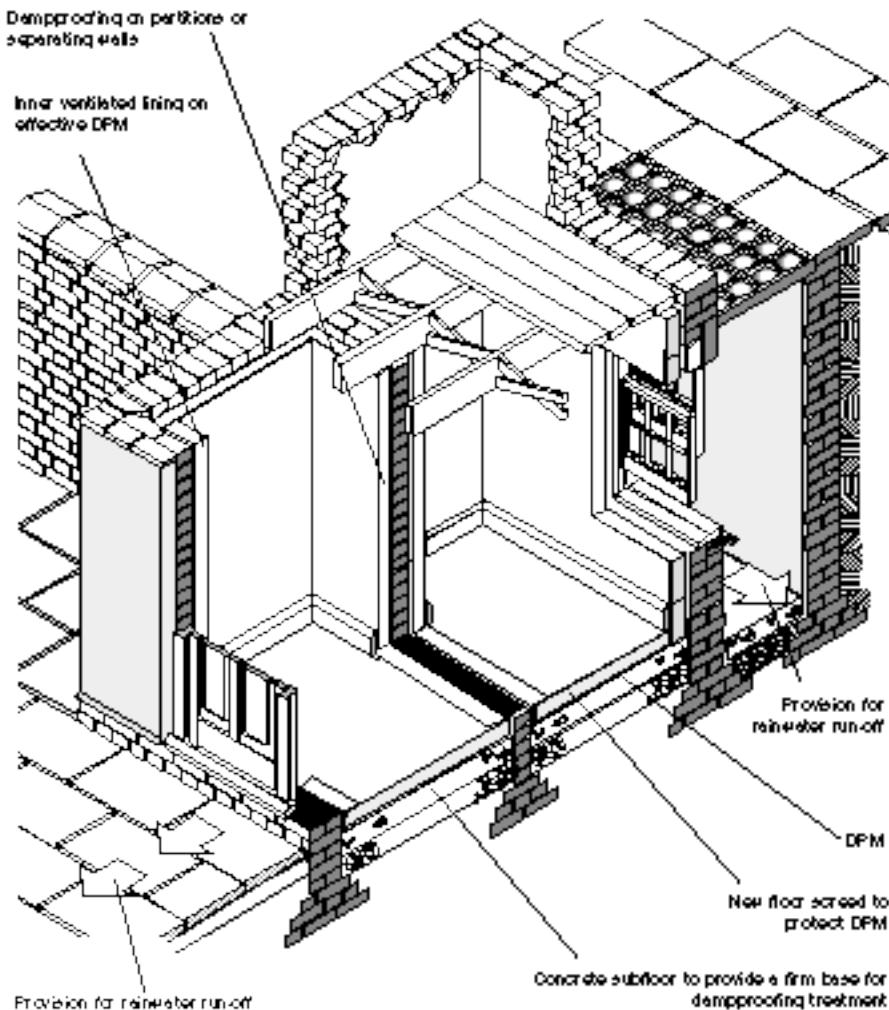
A basement in a building built on a sloping site may give rise to problems such as continuity of damp-proofing, and the need to provide DPMs and DPCs for internal walls in addition to floors
